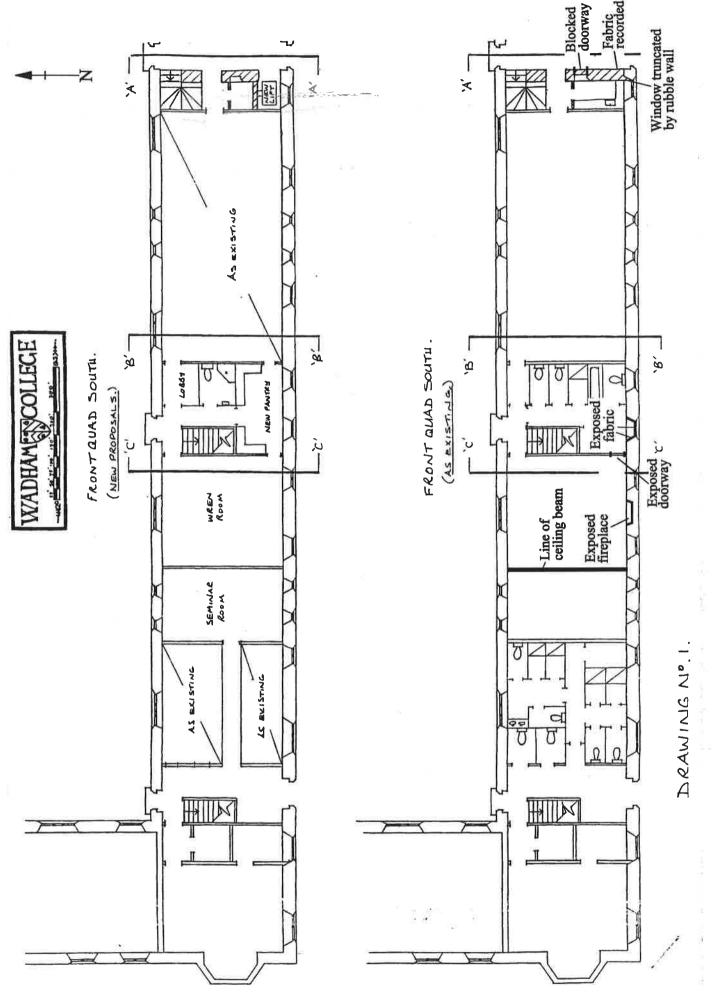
Ground Floor Plans, showing changes above and archaeological observations below, at 1:200
